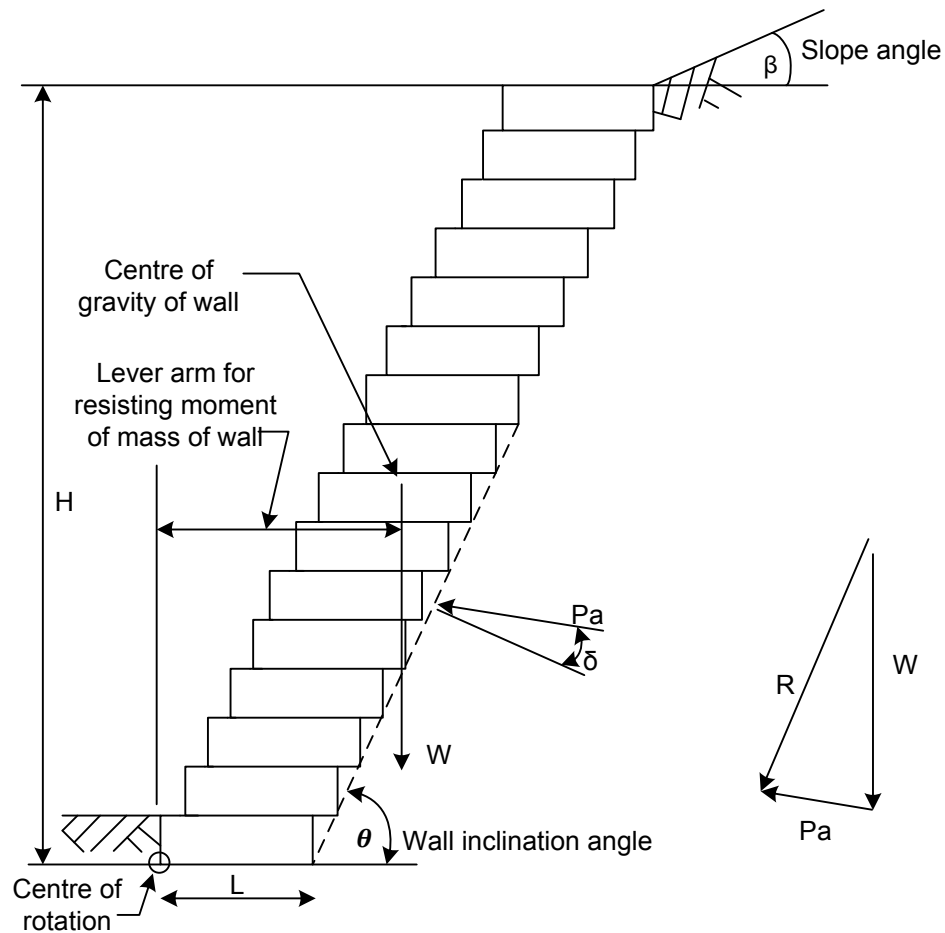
Forces acting on a typical section of a CRB wall (CMA, 1999)
